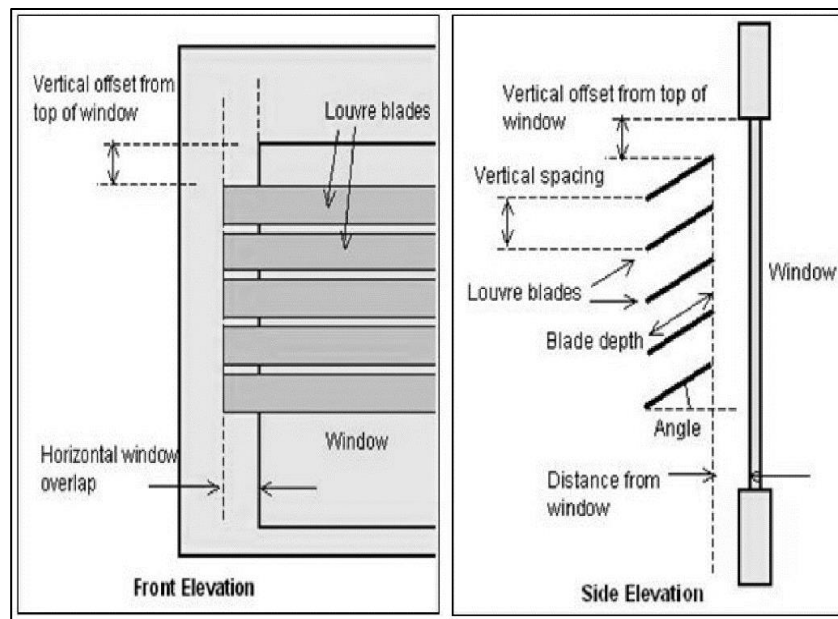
Elevation of applied louvers to protect glazed surfaces of the building
